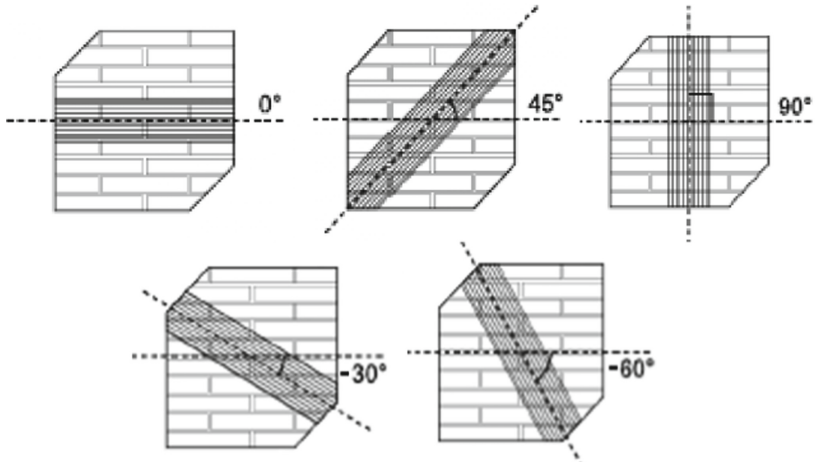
Masonry wallets strengthened with B-GFRP strips tested by diagonal compression tests.
